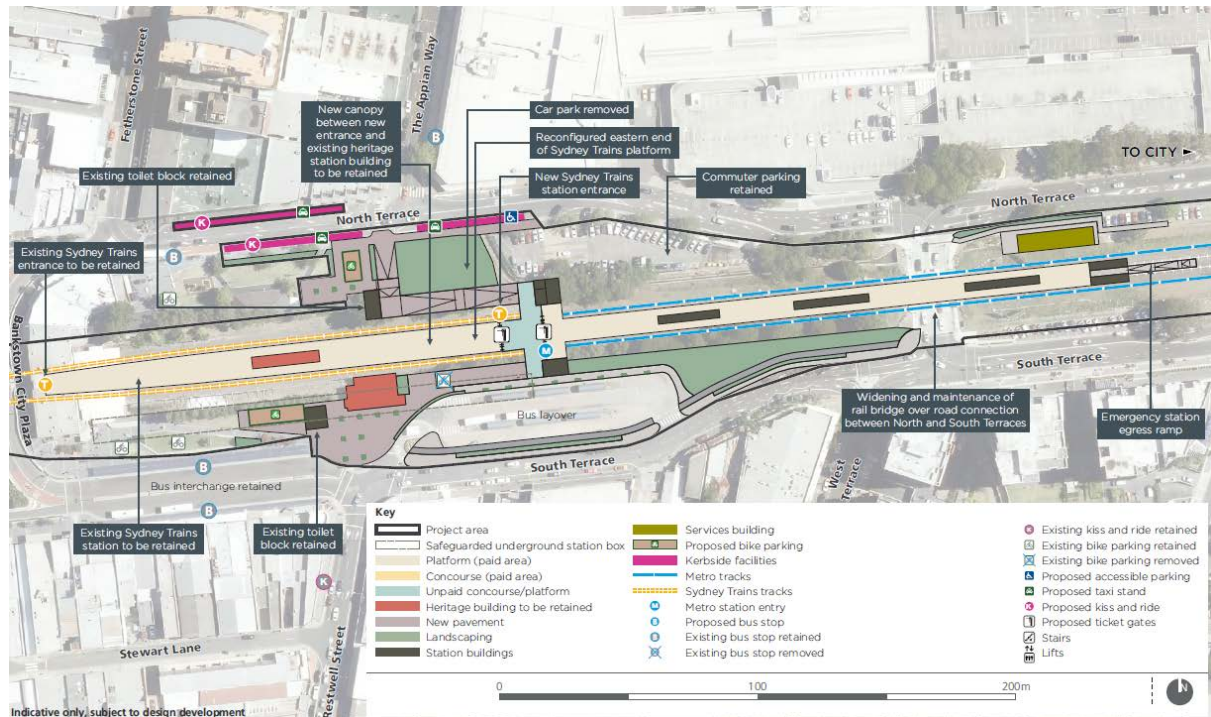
| Approved Bankstown Station layout (Source: Proponent's Modification Report)
